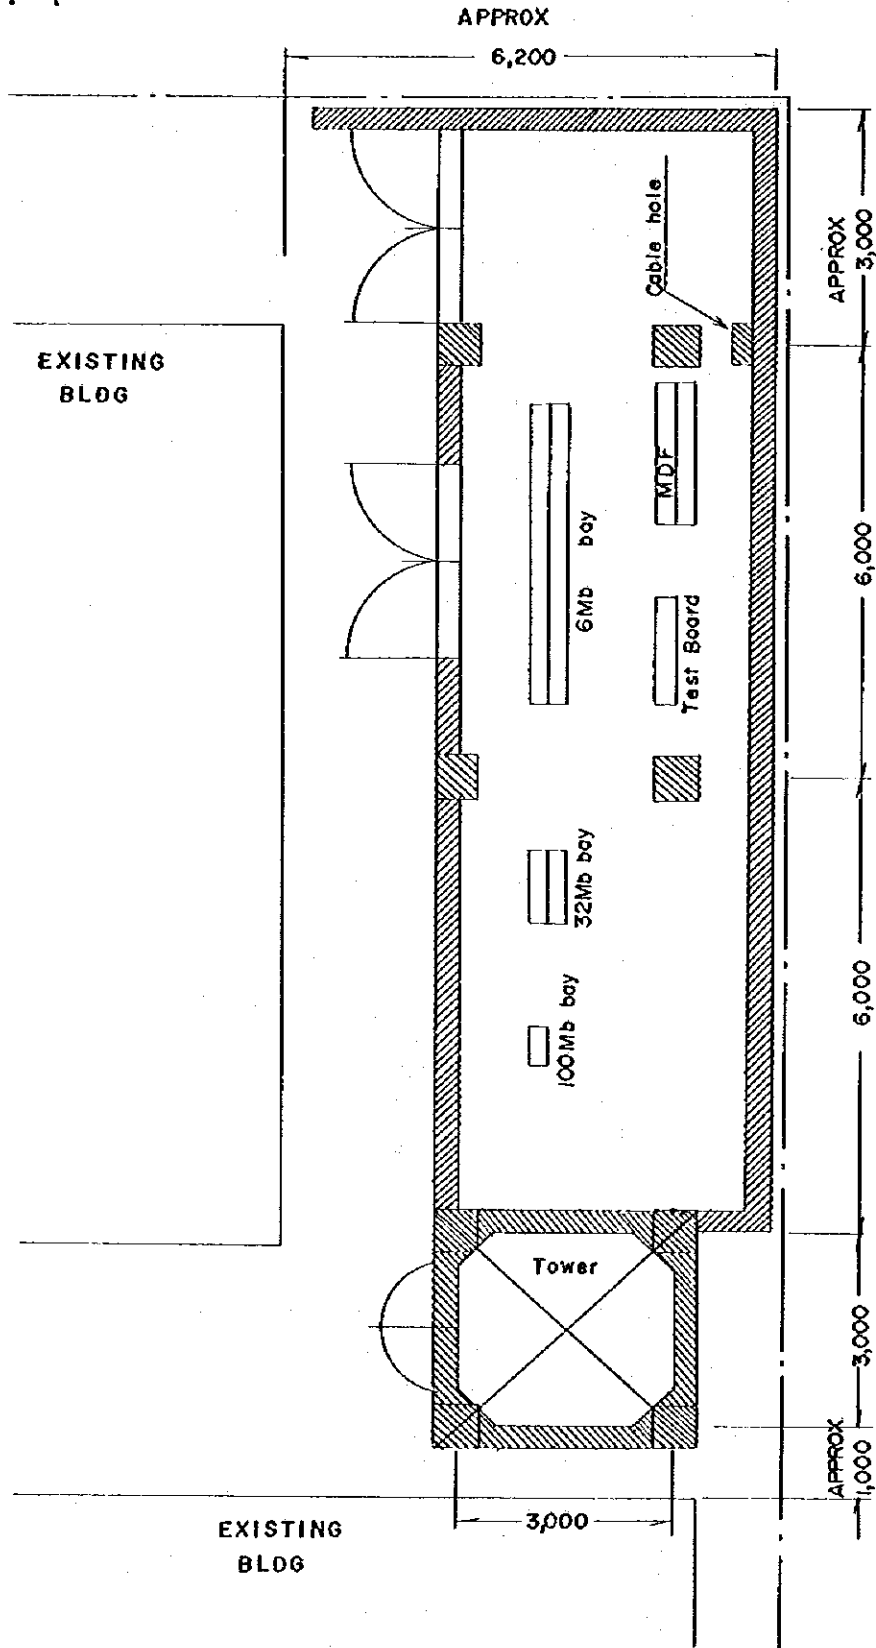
t Floor (to be installed Carrier equipment) of proposed new building
